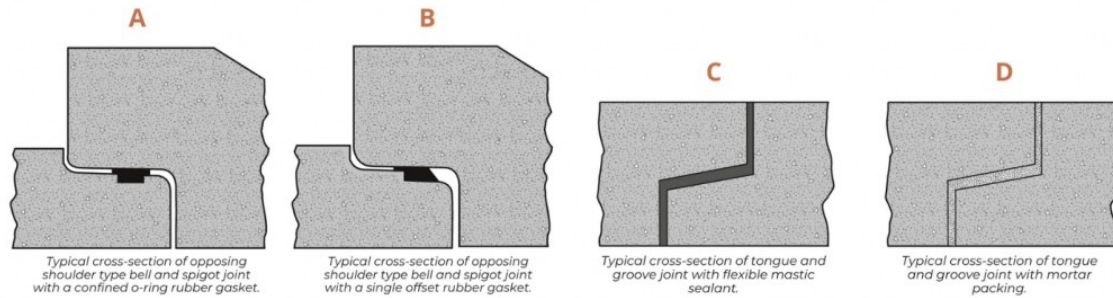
Reinforced concrete pipe joints: bell-and-spigot joints with (a) confined o-ring gasket (b) single offset gasket, or tongue-in-groove joints with (c) mastic sealant or (d) mortar packing (American Concrete Pipe Institute, <https://blog.concretepipe.org/debunking-misconceptions-about-concrete-pipe-performance>).
